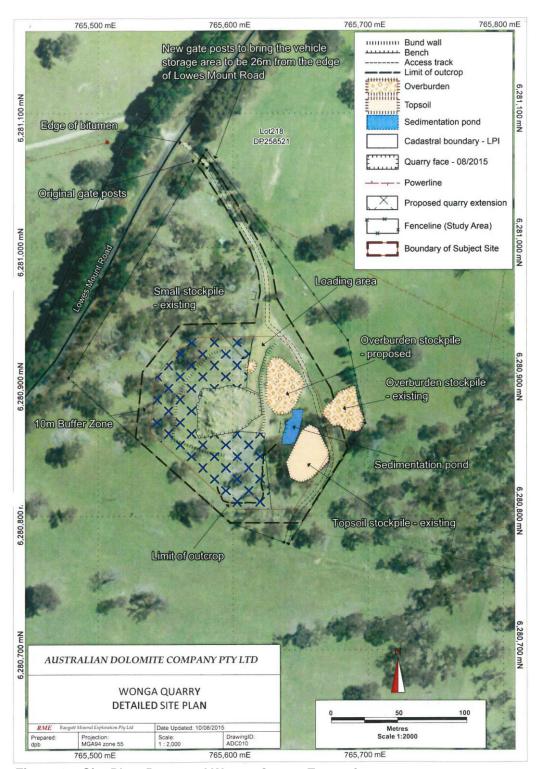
Site Plan, Proposed Wonga Quarry Expansion
